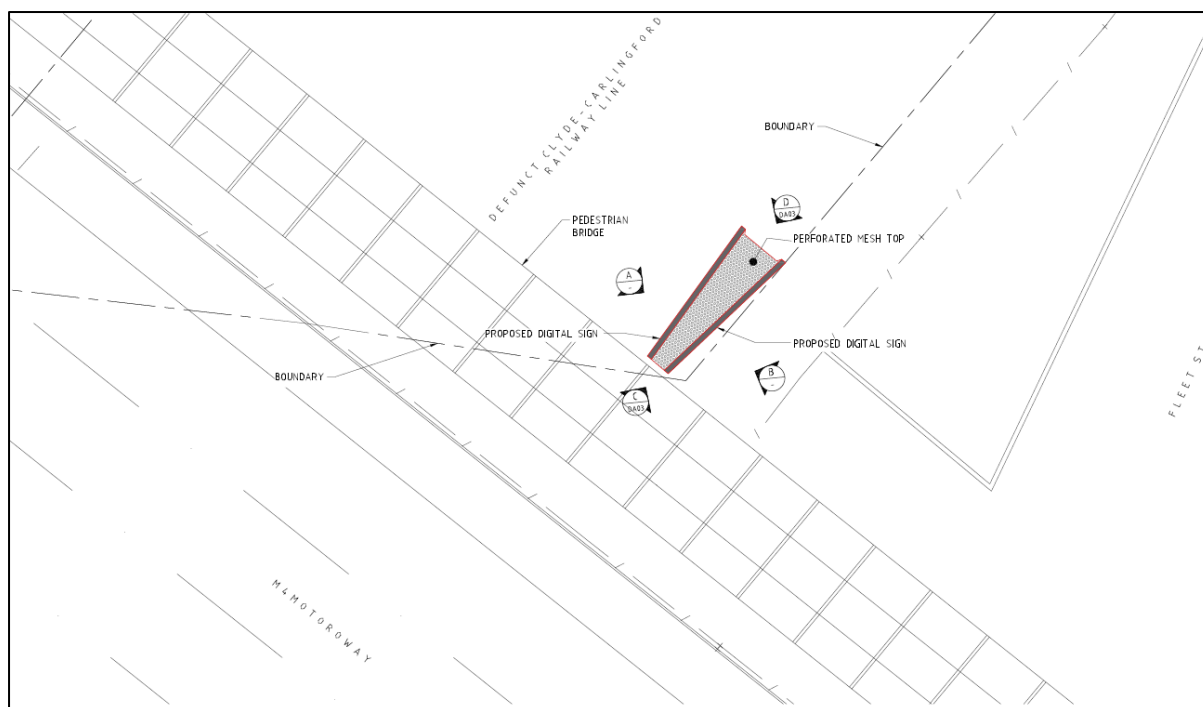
| Site plan (Source: Proposed Digital Sign General Arrangement and Site Plan, Dennis Bunt Consulting, 2022)
